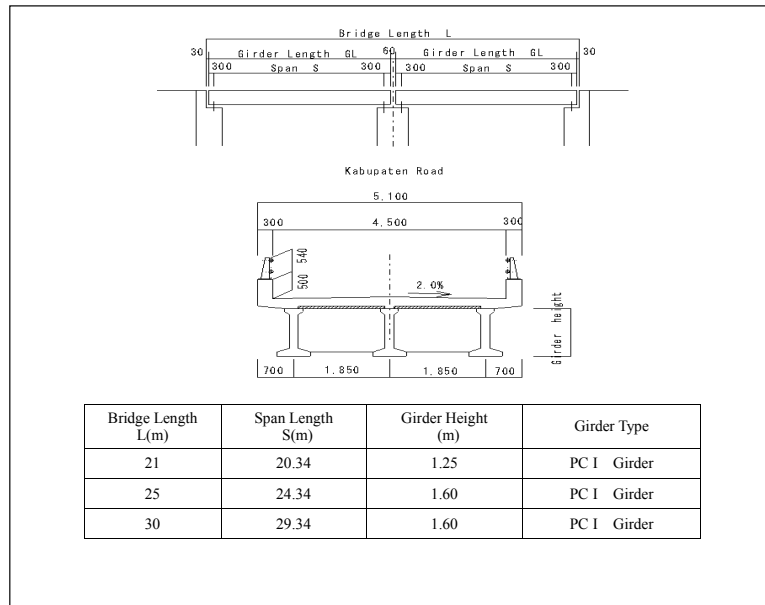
General Drawing of PCI Section Girder Bridge for Bridge Construction Type
